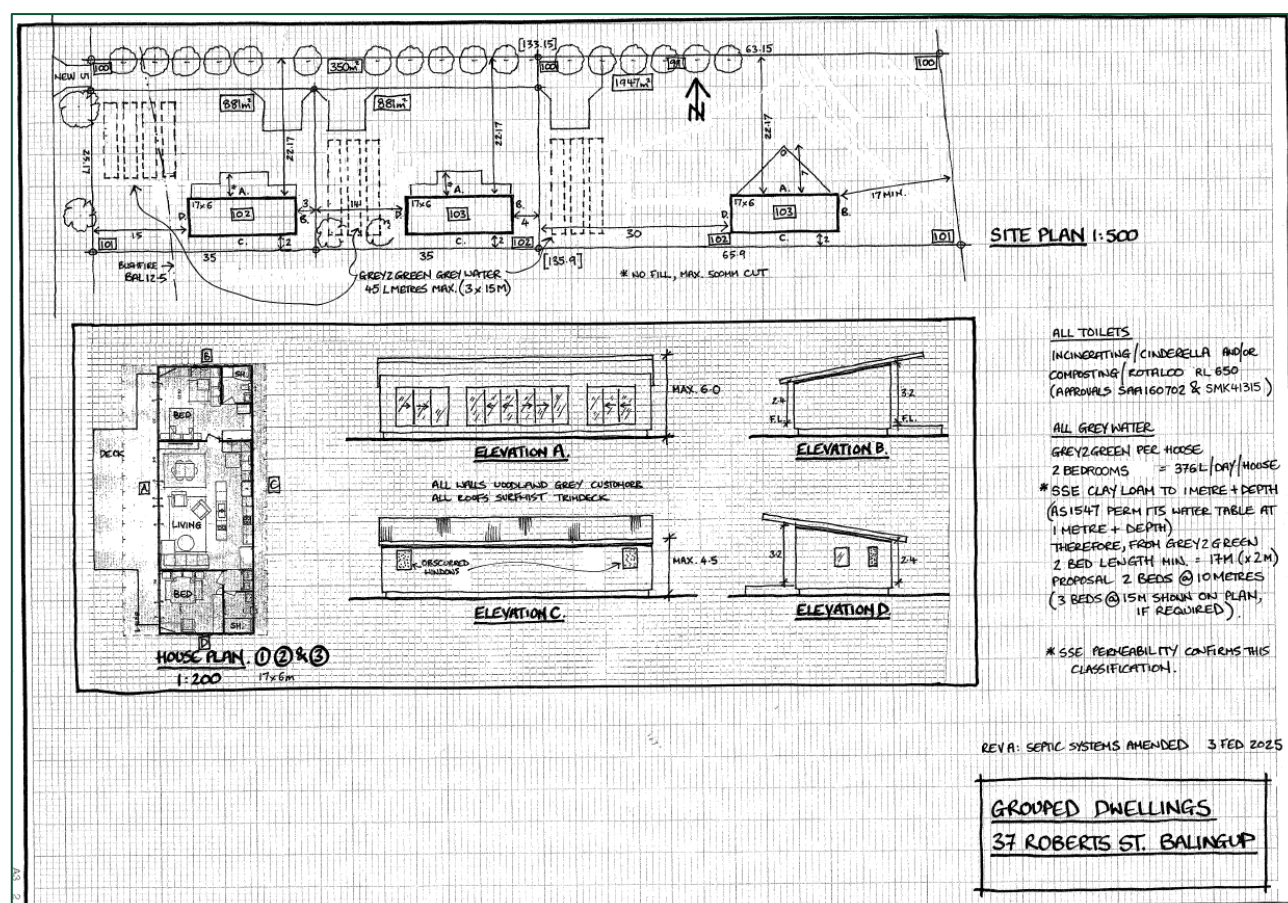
37 Roberts Street Plans dated 3 February 2025
